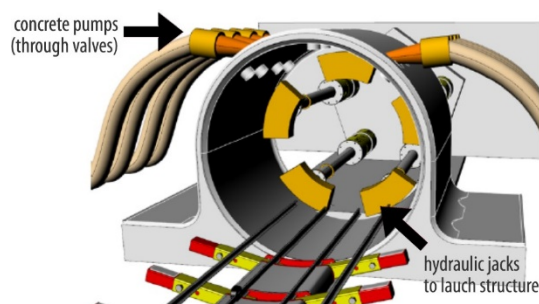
Concreting location with circular arrangement of jacks (retracted). Forms are not shown.
